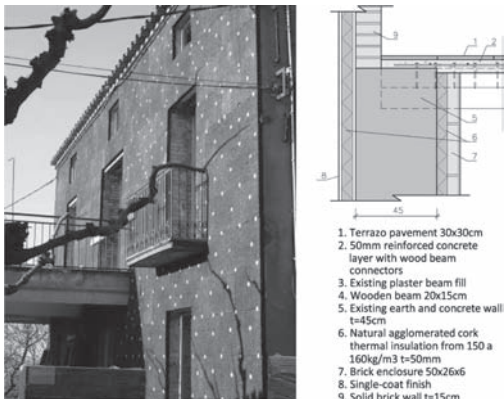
Rammed earth cladding with natural cork. Isolated housing. Ruffa, Lleida. Architect: Josep Maria Puigdemassa.
